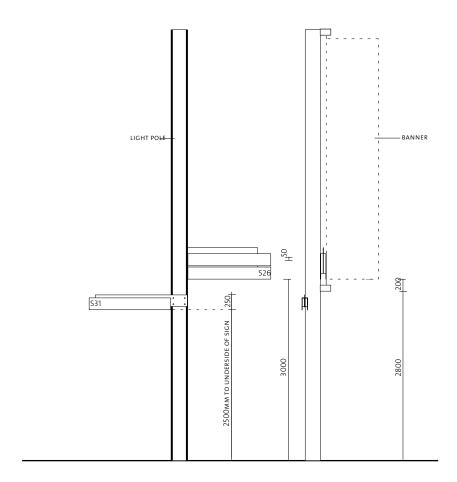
(EXAMPLE 2) elevation sign mounted to light pole
